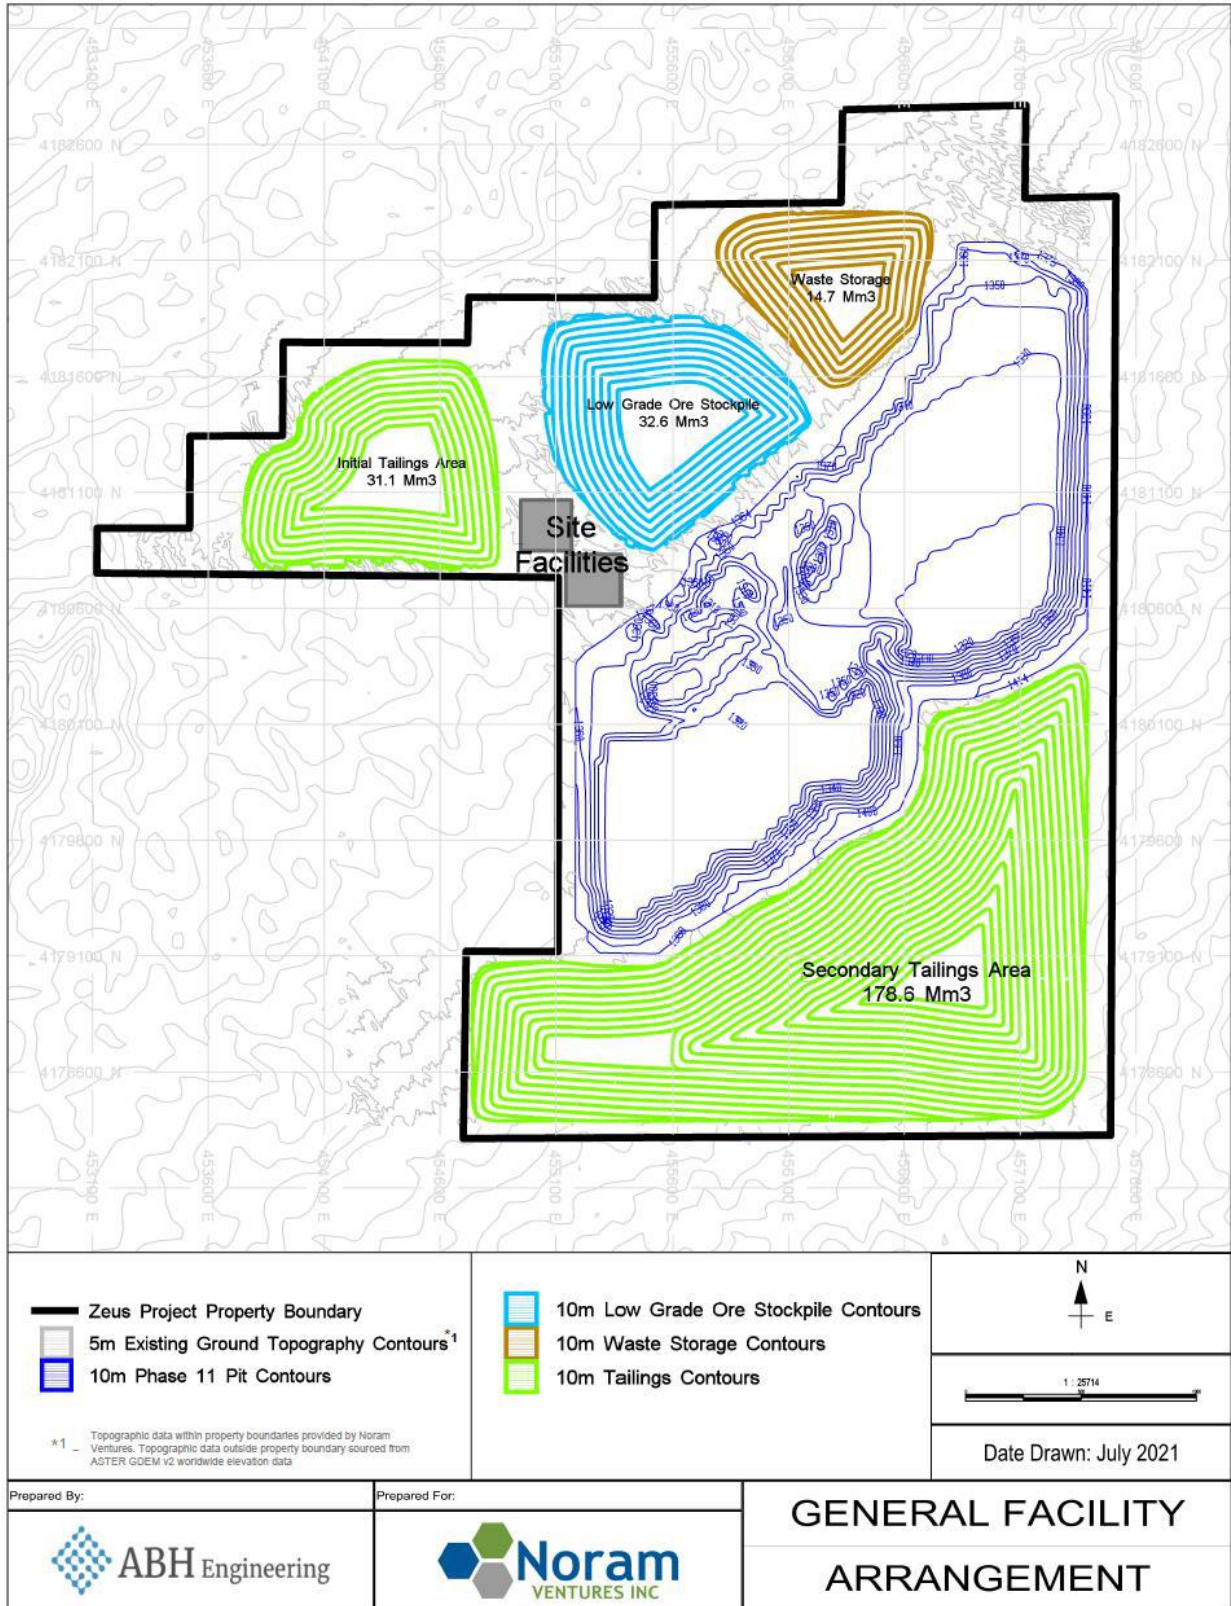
Zeus Lithium Project Conceptual Site Layout
